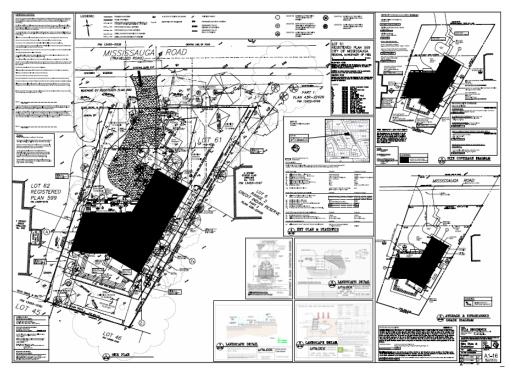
The proposed development at 1422 Mississauga Road. (Image provided by the property owner.)
